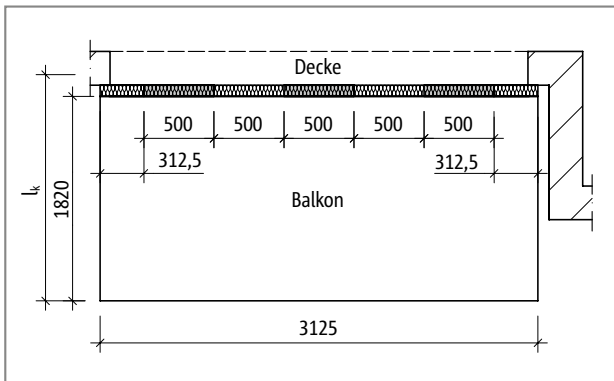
Schöck Isokorb® T type K-E, K-T: Static system, layout
